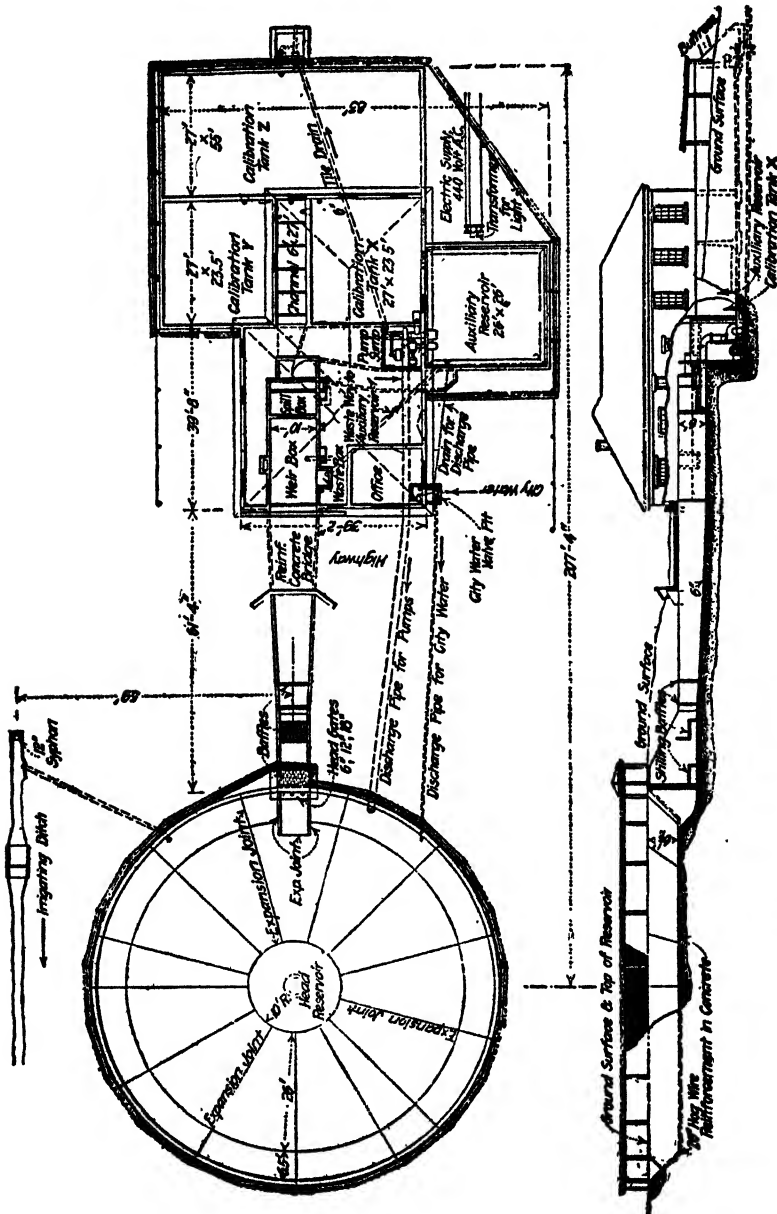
Plan and sectional elevations of the Fort Collins hydraulic laboratory.
